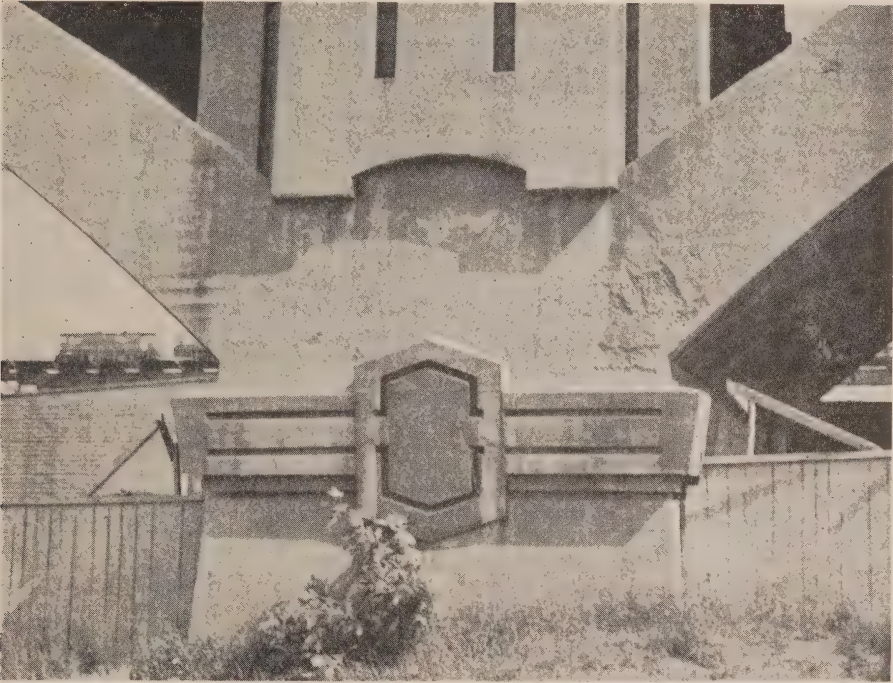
Deterioration of concrete caused by drainage caught at the junction of arch rib and pier.
